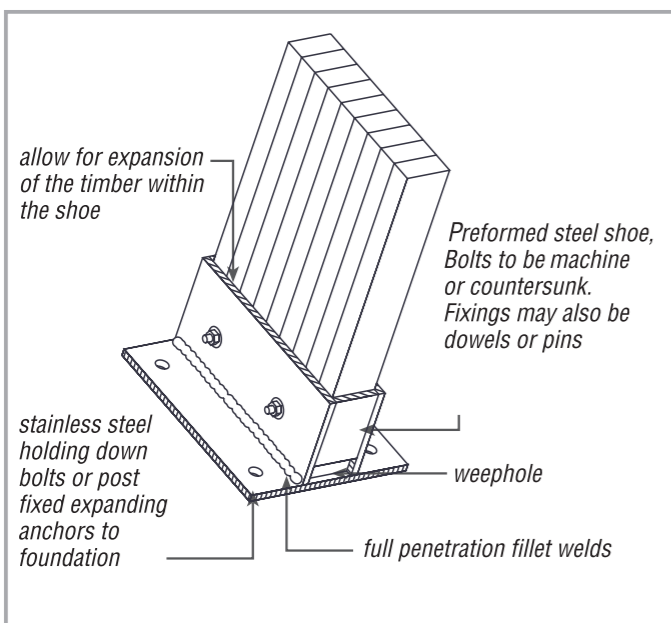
External Hinge Anchorage for Arch
